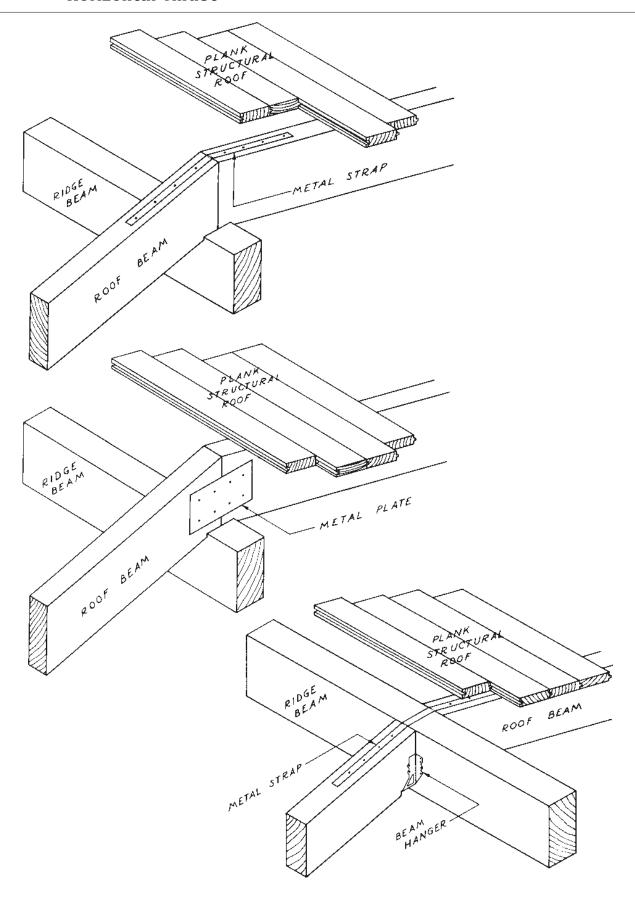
Methods of Supporting Roof Beam on Ridge Beam to Absorb Horizontal Thrust
